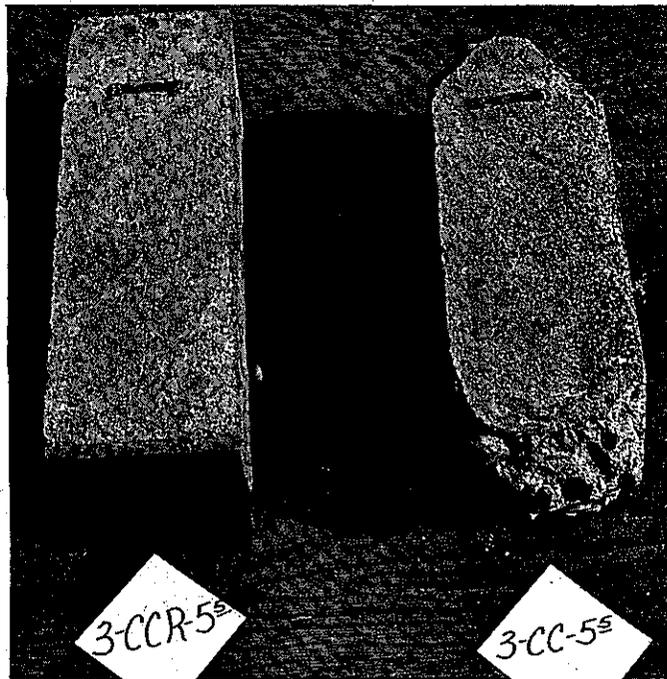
5-1/2-sack shrinkage compensated cement concrete beams after 26 months sulfate exposure. Beam on left is externally restrained.
